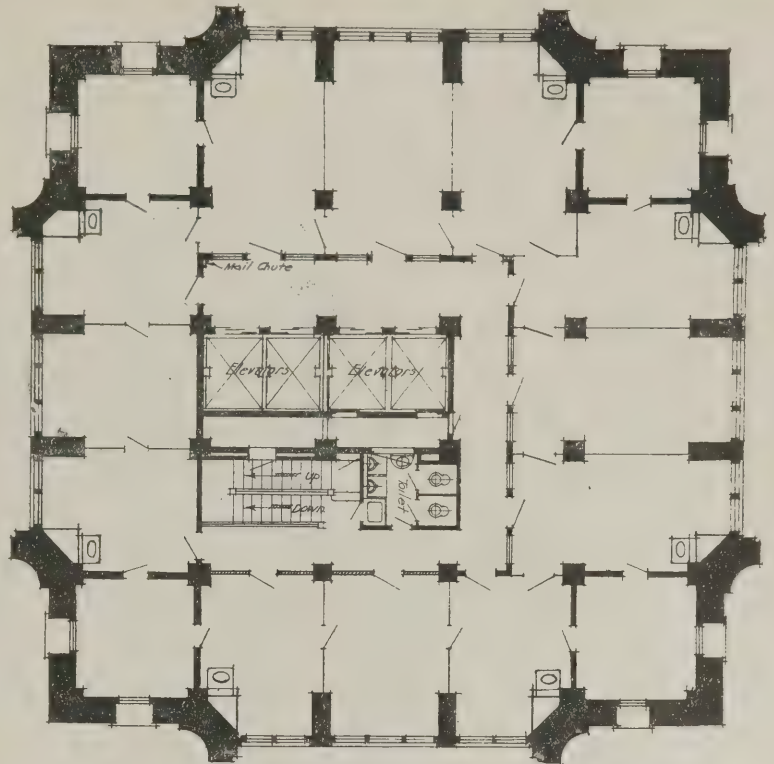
TYPICAL TOWER FLOOR PLAN IN THE SINGER BUILDING.
